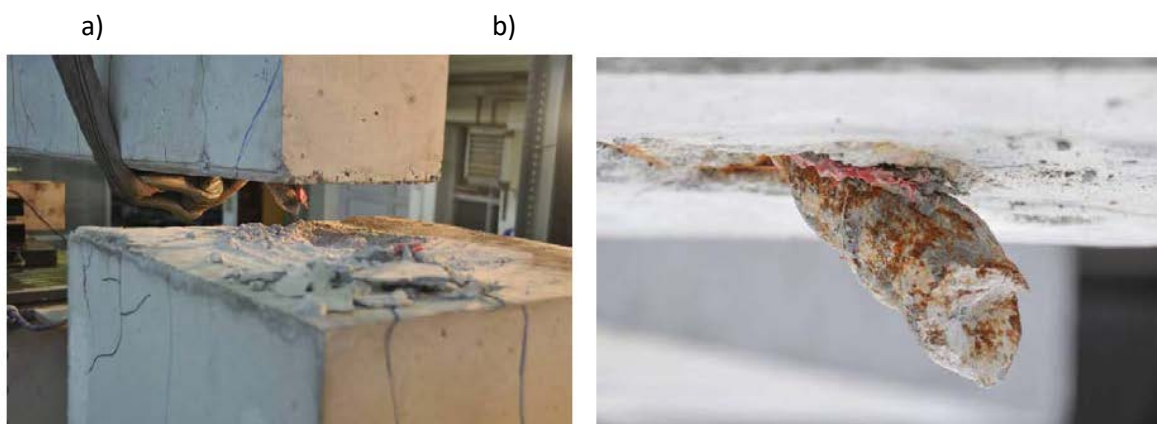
Actual photos of a broken dowel after the test completed for specimen S1, [Ref.: 027]
